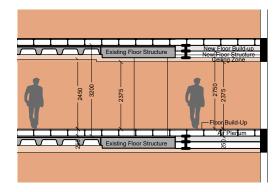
Floorplate layouts and sections assessed for daylighting studies
